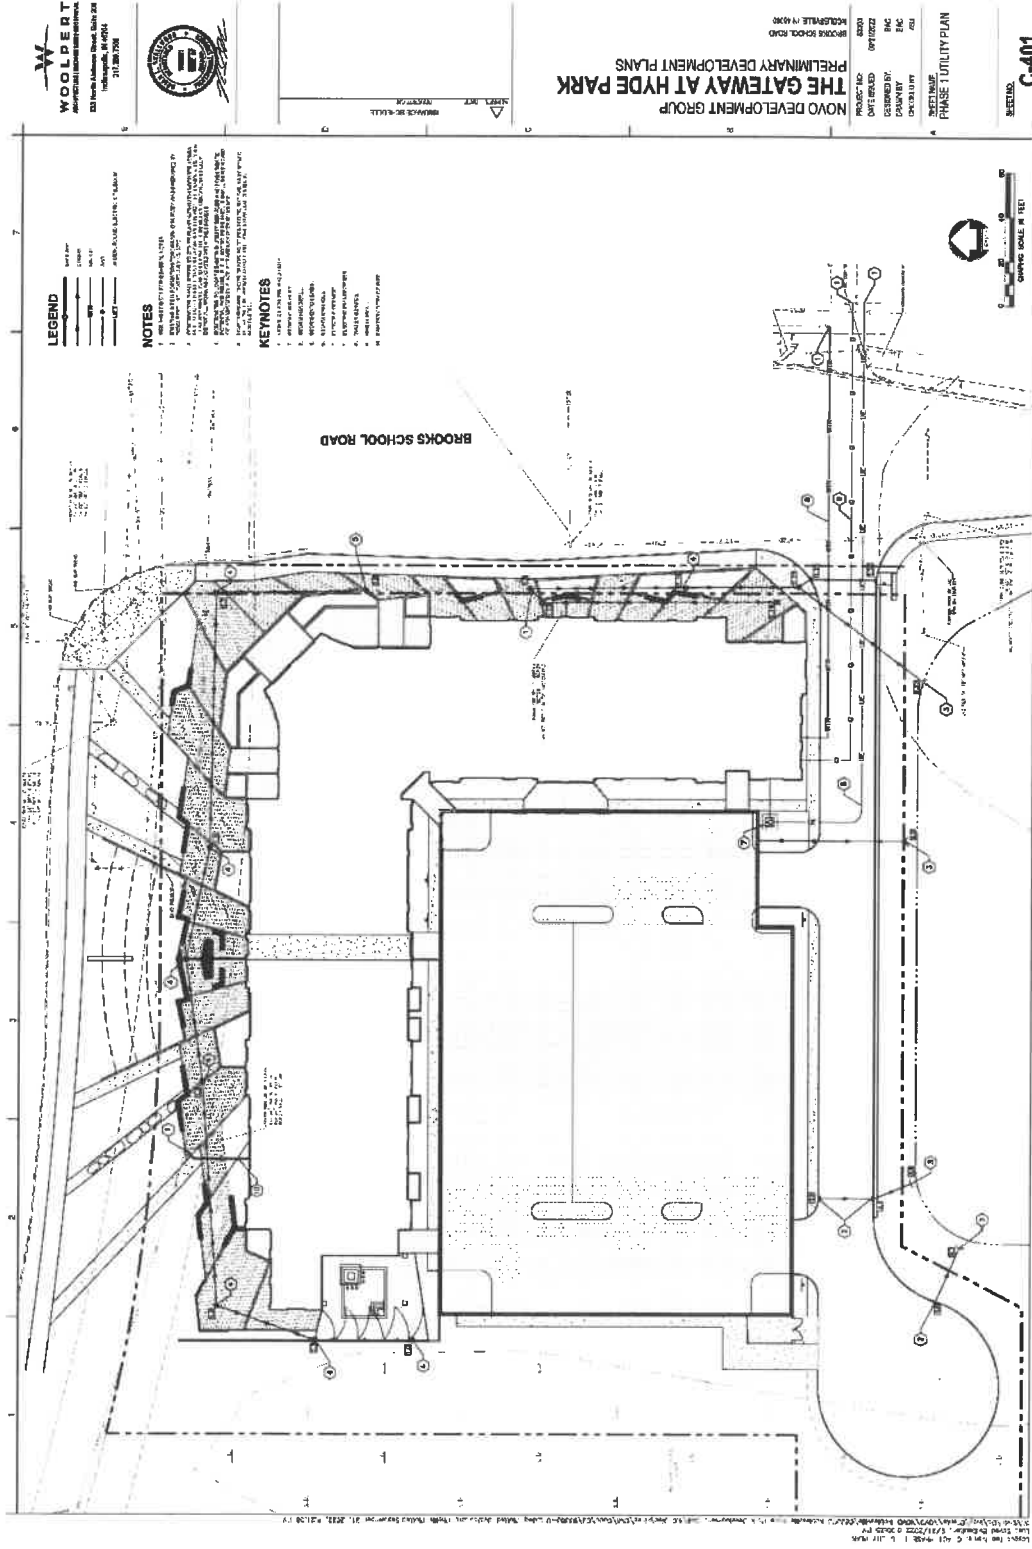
EXHIBIT D, CONT. PRELIMINARY DEVELOPMENT PLAN
